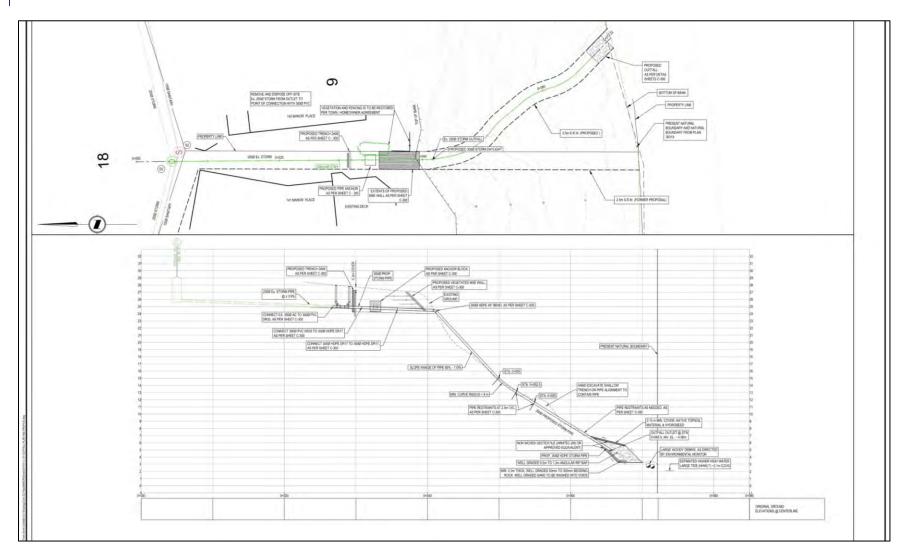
Typical design of stormwater pipe running down a steep slope and discharging through a rock exfiltration gallery.
